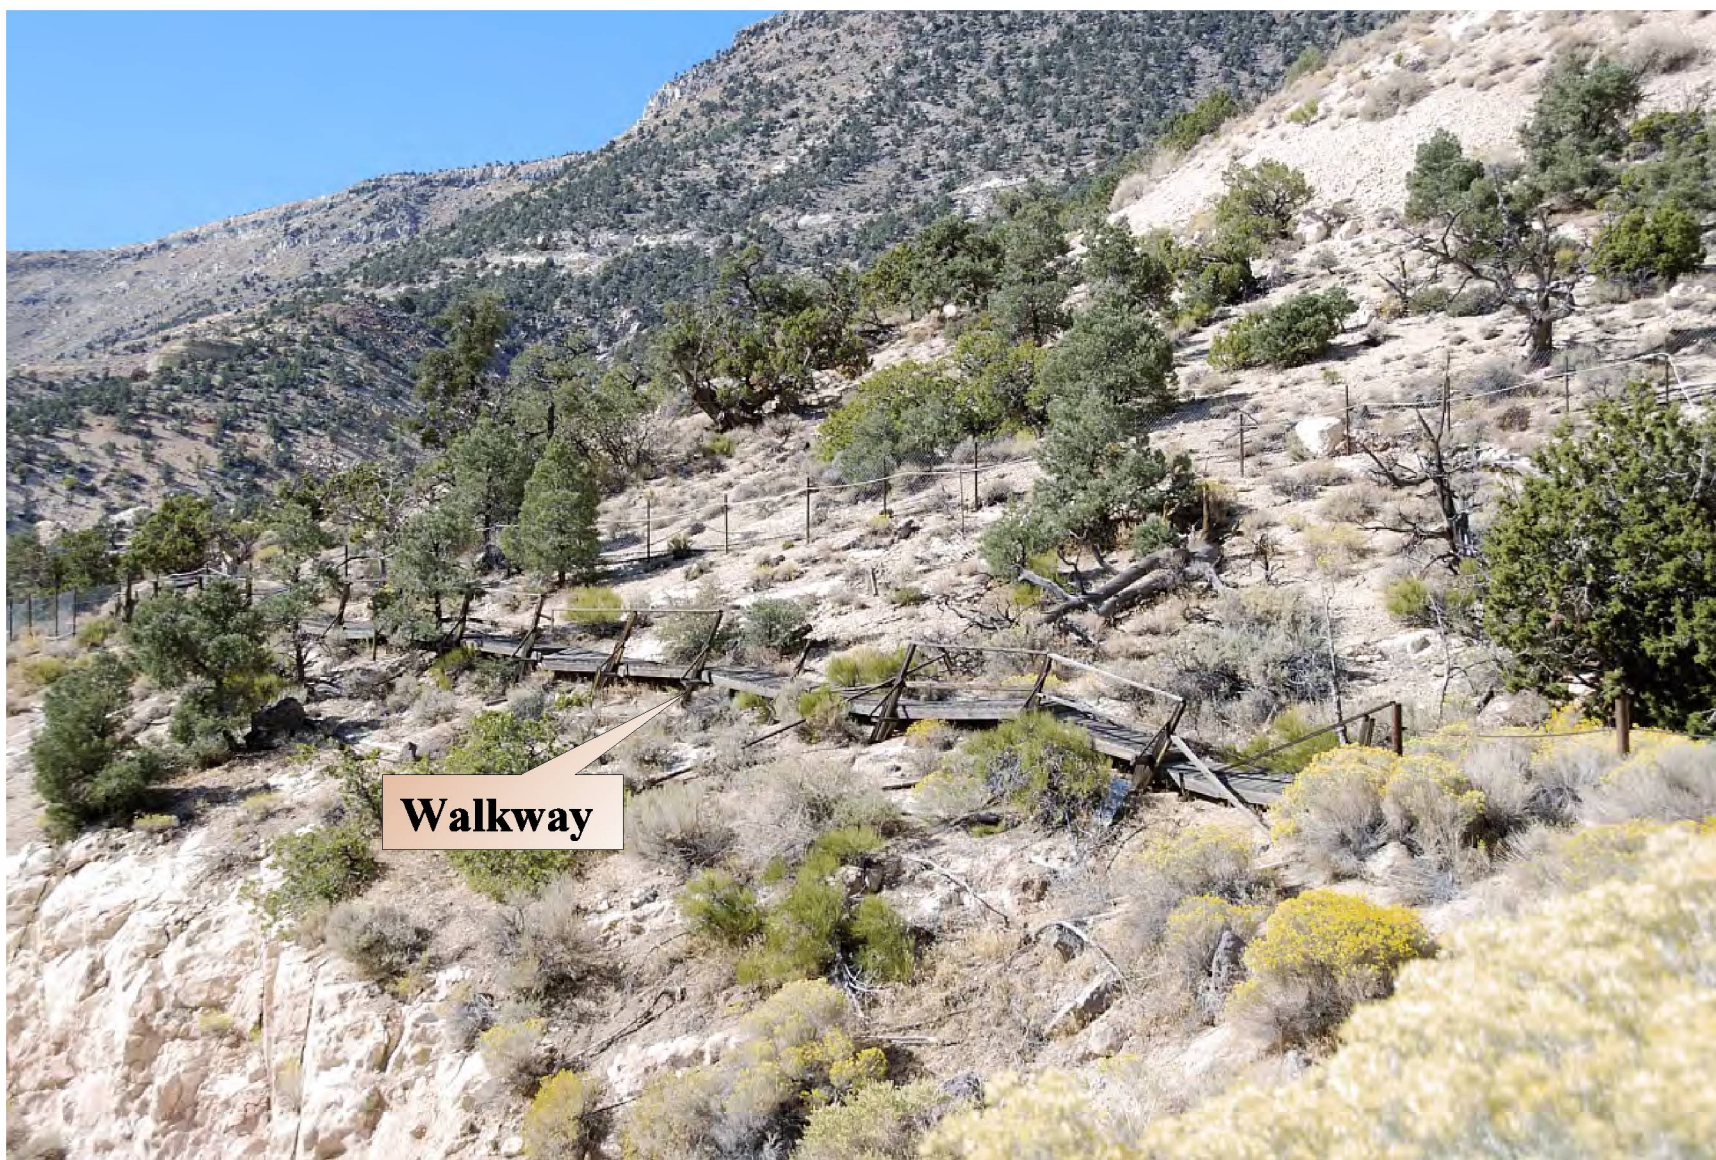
Feature 51, wooden walkway, U12n Tunnel, view south (2008).
